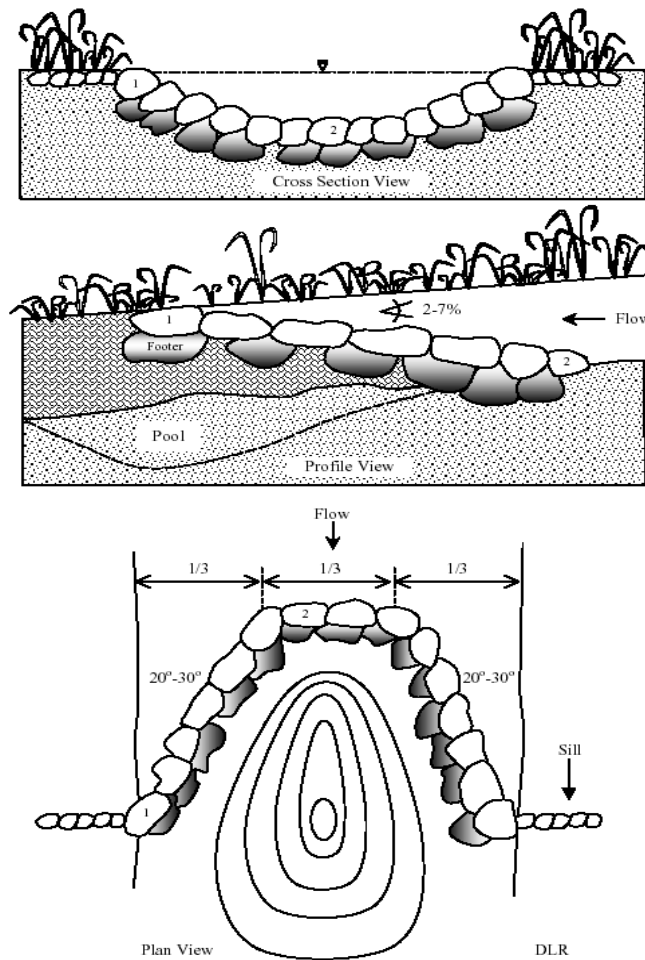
Schematic Cross Vane Cross Section, Profile, and Plan View (from Rosgen, 2001b).
